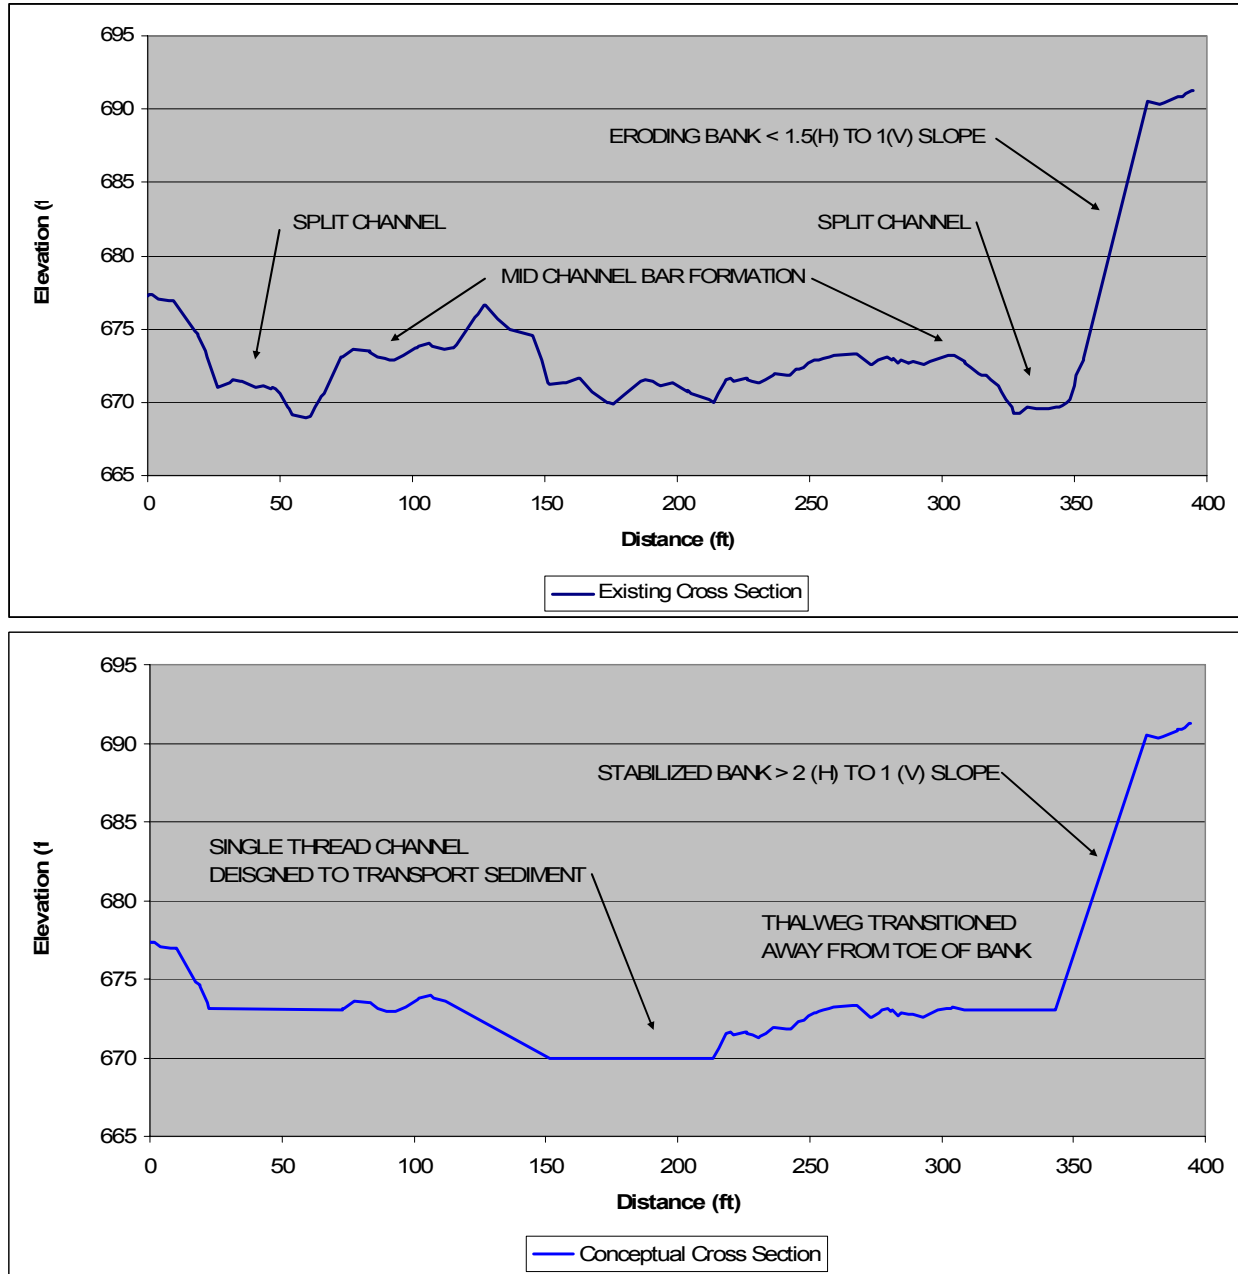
Bank Stabilization Upstream of Park Street Bridge - Concept Cross-Section ST 400.
